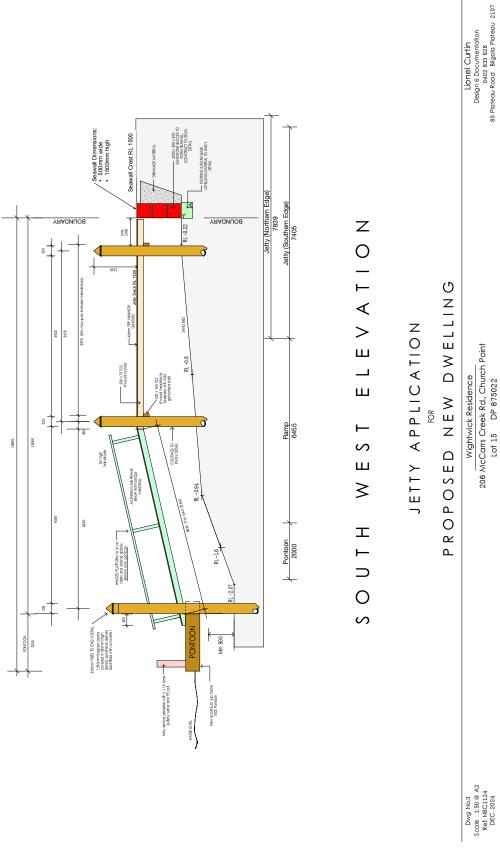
South-west elevation of proposed jetty, pontoon and seawall
